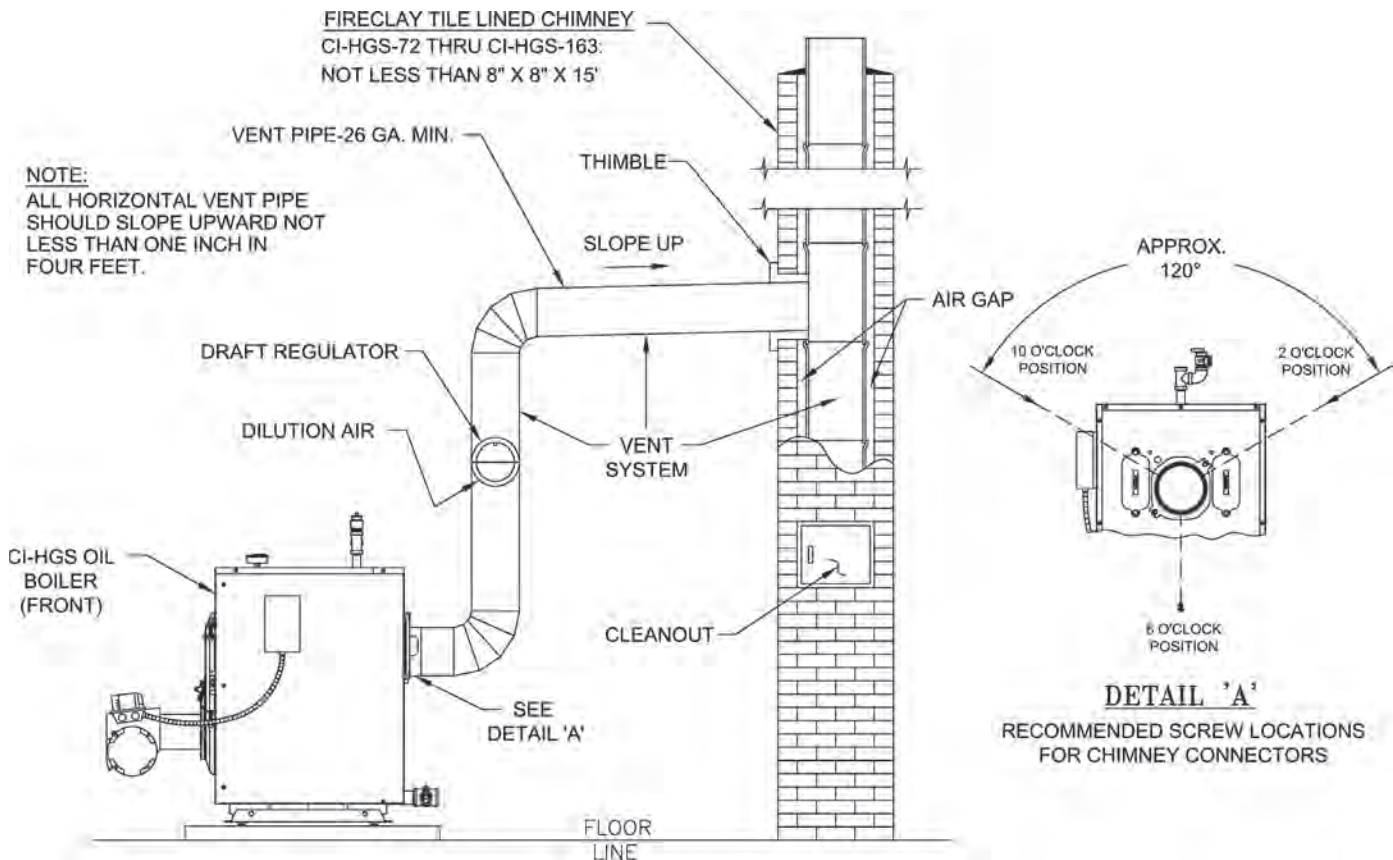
Recommended Vent Pipe Arrangement and Chimney Requirements
